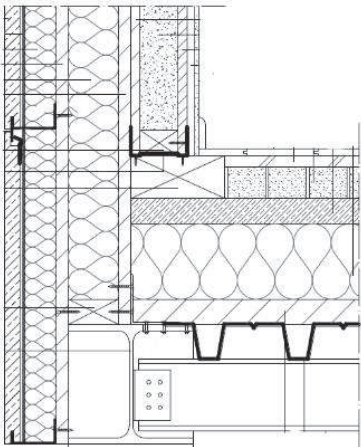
Particular of the lowest vertical/horizontal wall junction.
